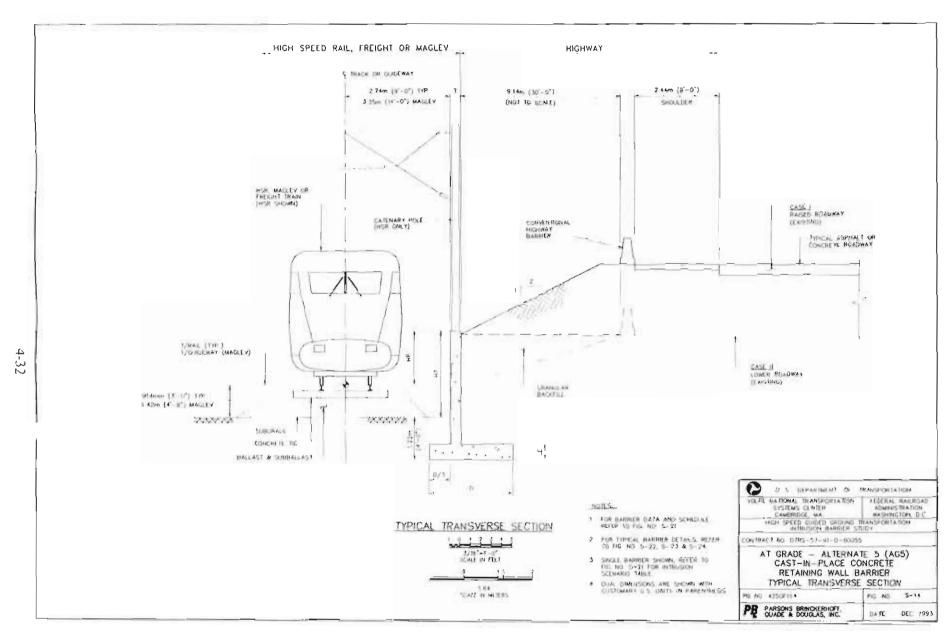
AT GRADE ALTERNATE 5: C.I.P. CONCRETE RETAINING WALL BARRIER - TRANSVERSE SECTION/RR & MAGLEV
